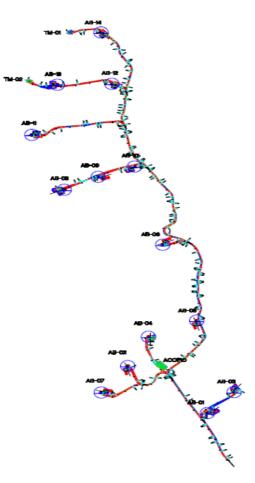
Vutcani Extension Wind Farm Turbine Layout Plan
